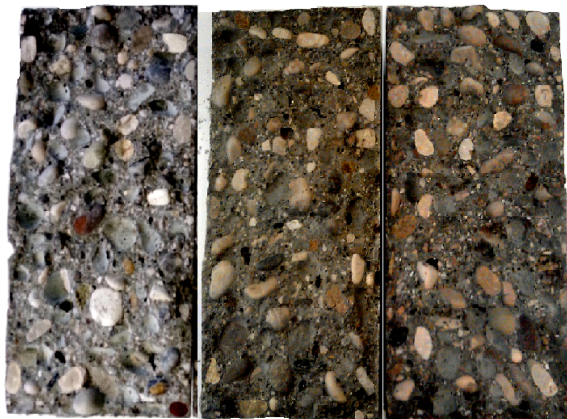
Concrete surfaces after splitting failure: Control, CFA and CCFA mix.
